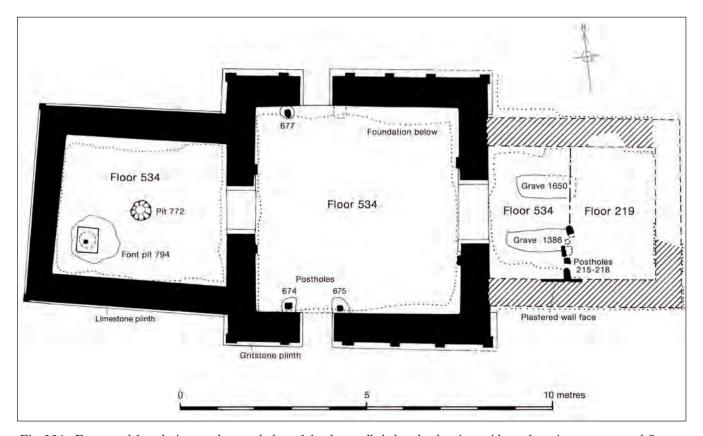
Excavated foundations and ground plan of the three-celled church, showing evidence for primary structural fixtures and furnishings. A dotted line indicates the edge of the foundation, where this projects beyond the line of the wall. Scale 1:100. Drawing: Warwick Rodwell
